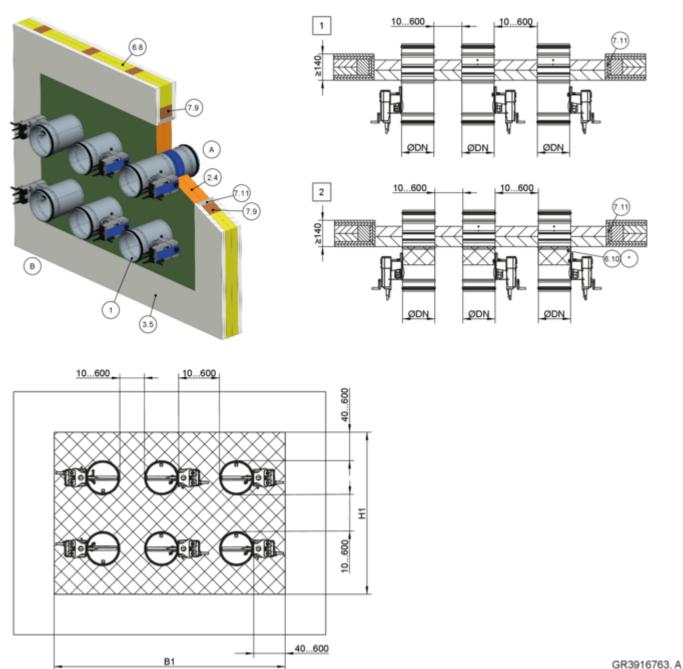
Dry mortarless installation with fire batt in lightweight partition wall with half-timbered construction - multiple occupancy of an installation opening
